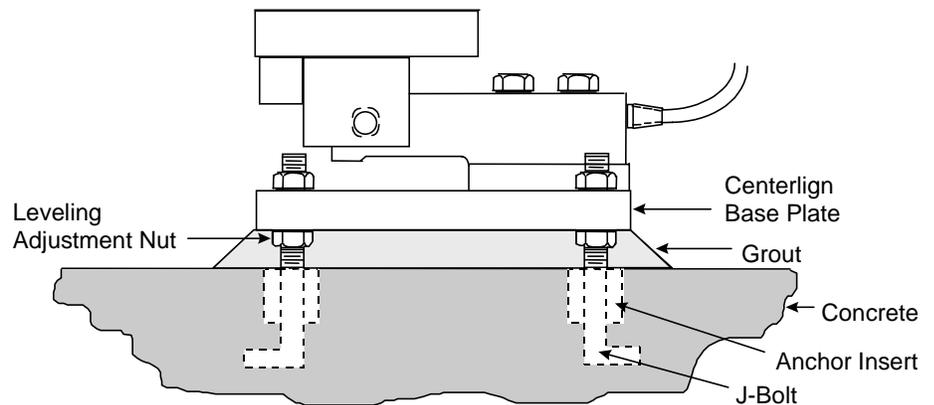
Base Plate Bolted to Unevel Concrete Floor
